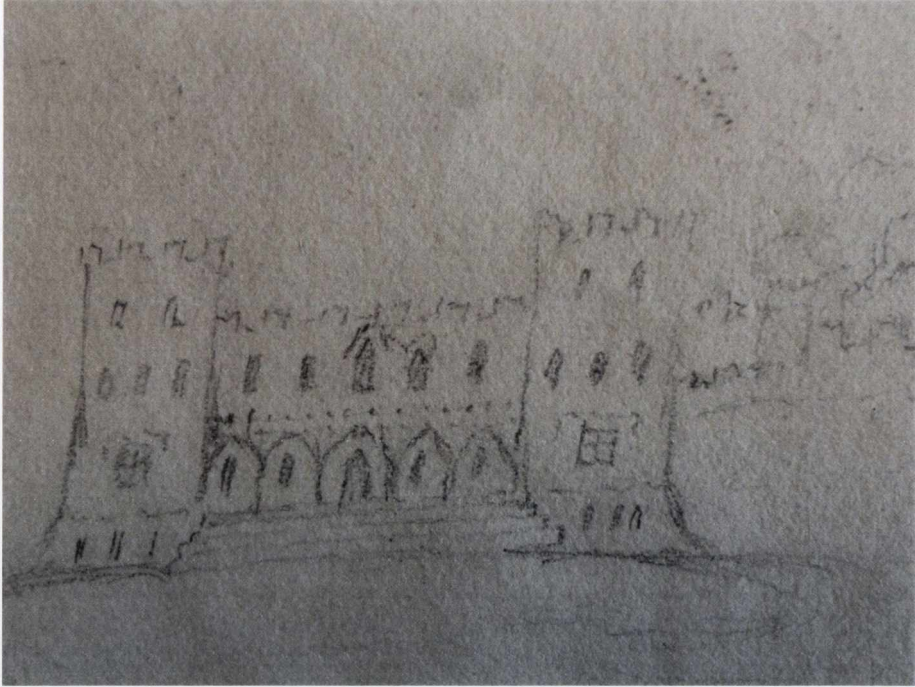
Sketch of proposed elevations, Charleville Castle, attrib. to C.M. Tisdall [1797], IAA, Charleville Forest Drawings Collection, 86/24/5, verso, courtesy of the Irish Architectural Archive.
